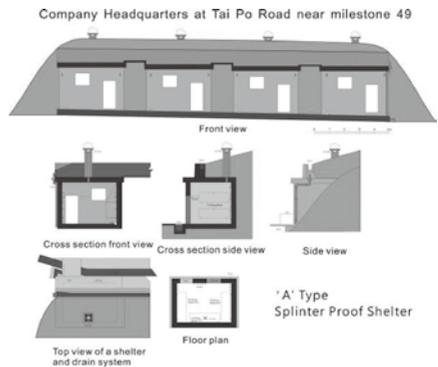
Layout of Company HQ at Tai Po Road near milestone 49
